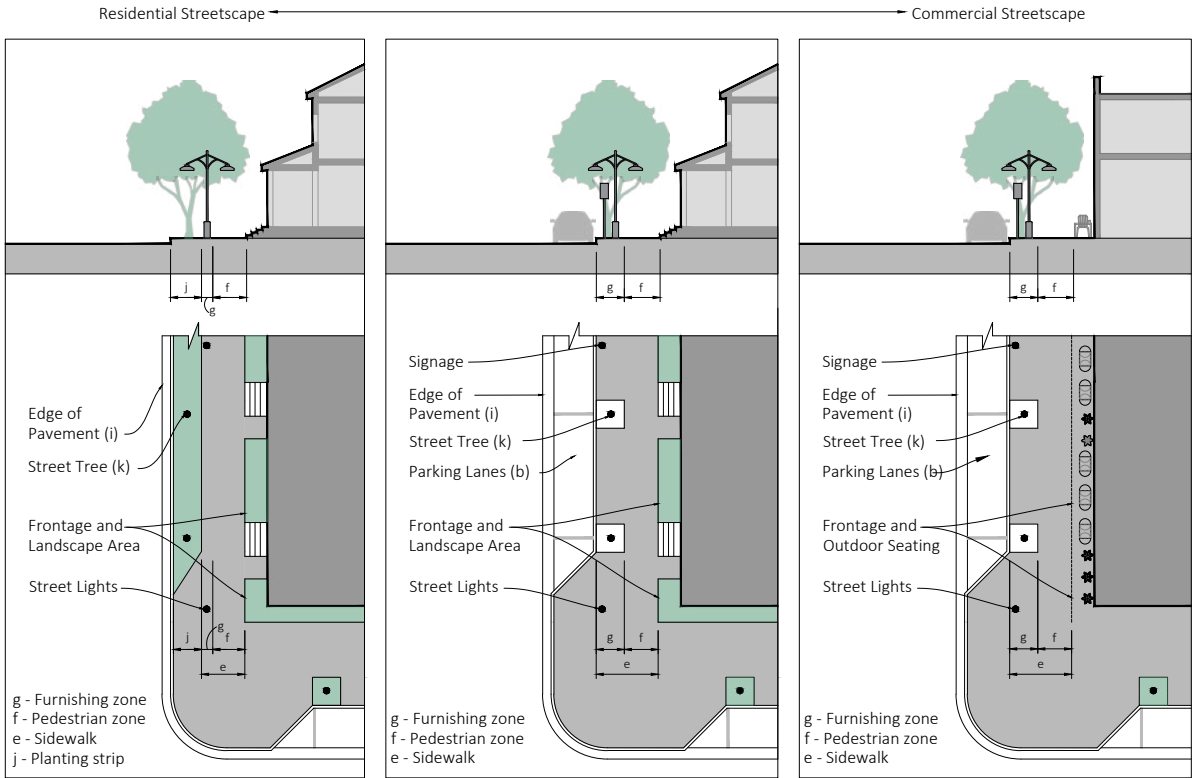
Residential streetscape conditions for townhouses in Delray Beach
